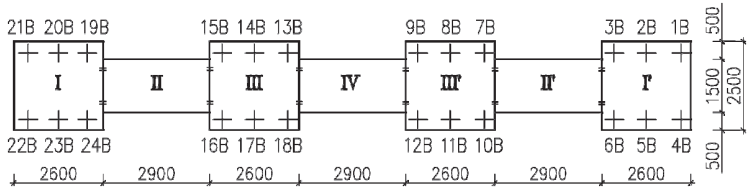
Line B in St. John's Church (overhead view) work joints and piles.
